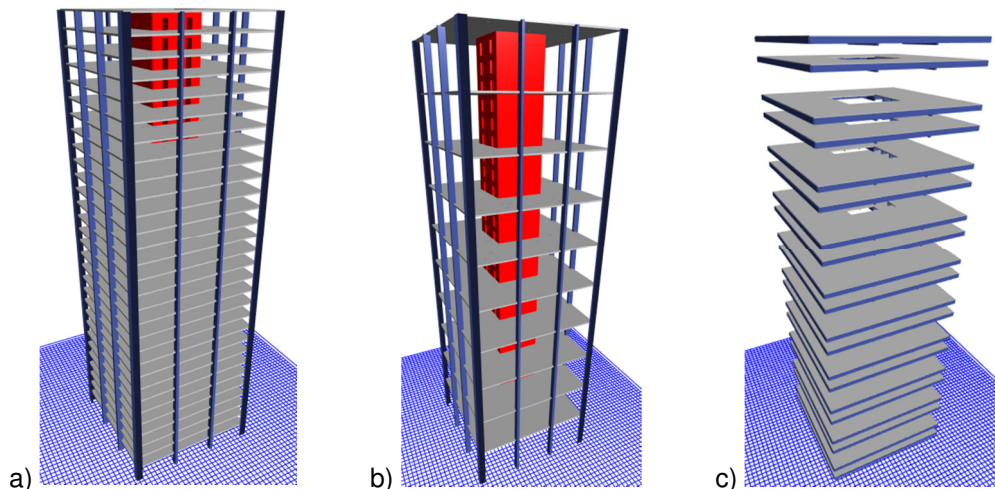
a) Concrete building; b) concrete elements of hybrid building; c) timber floors of hybrid building
